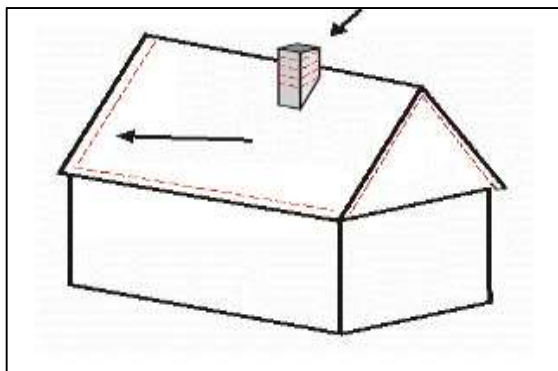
An example of line-type heat detector arrangement on the roof and around the chimney
